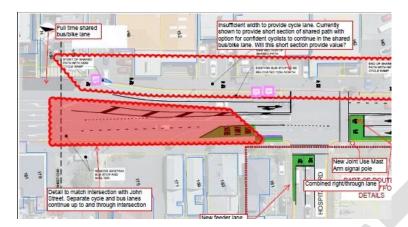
Excerpt from plan – proposed shared path on Adelaide Road (C201A)
